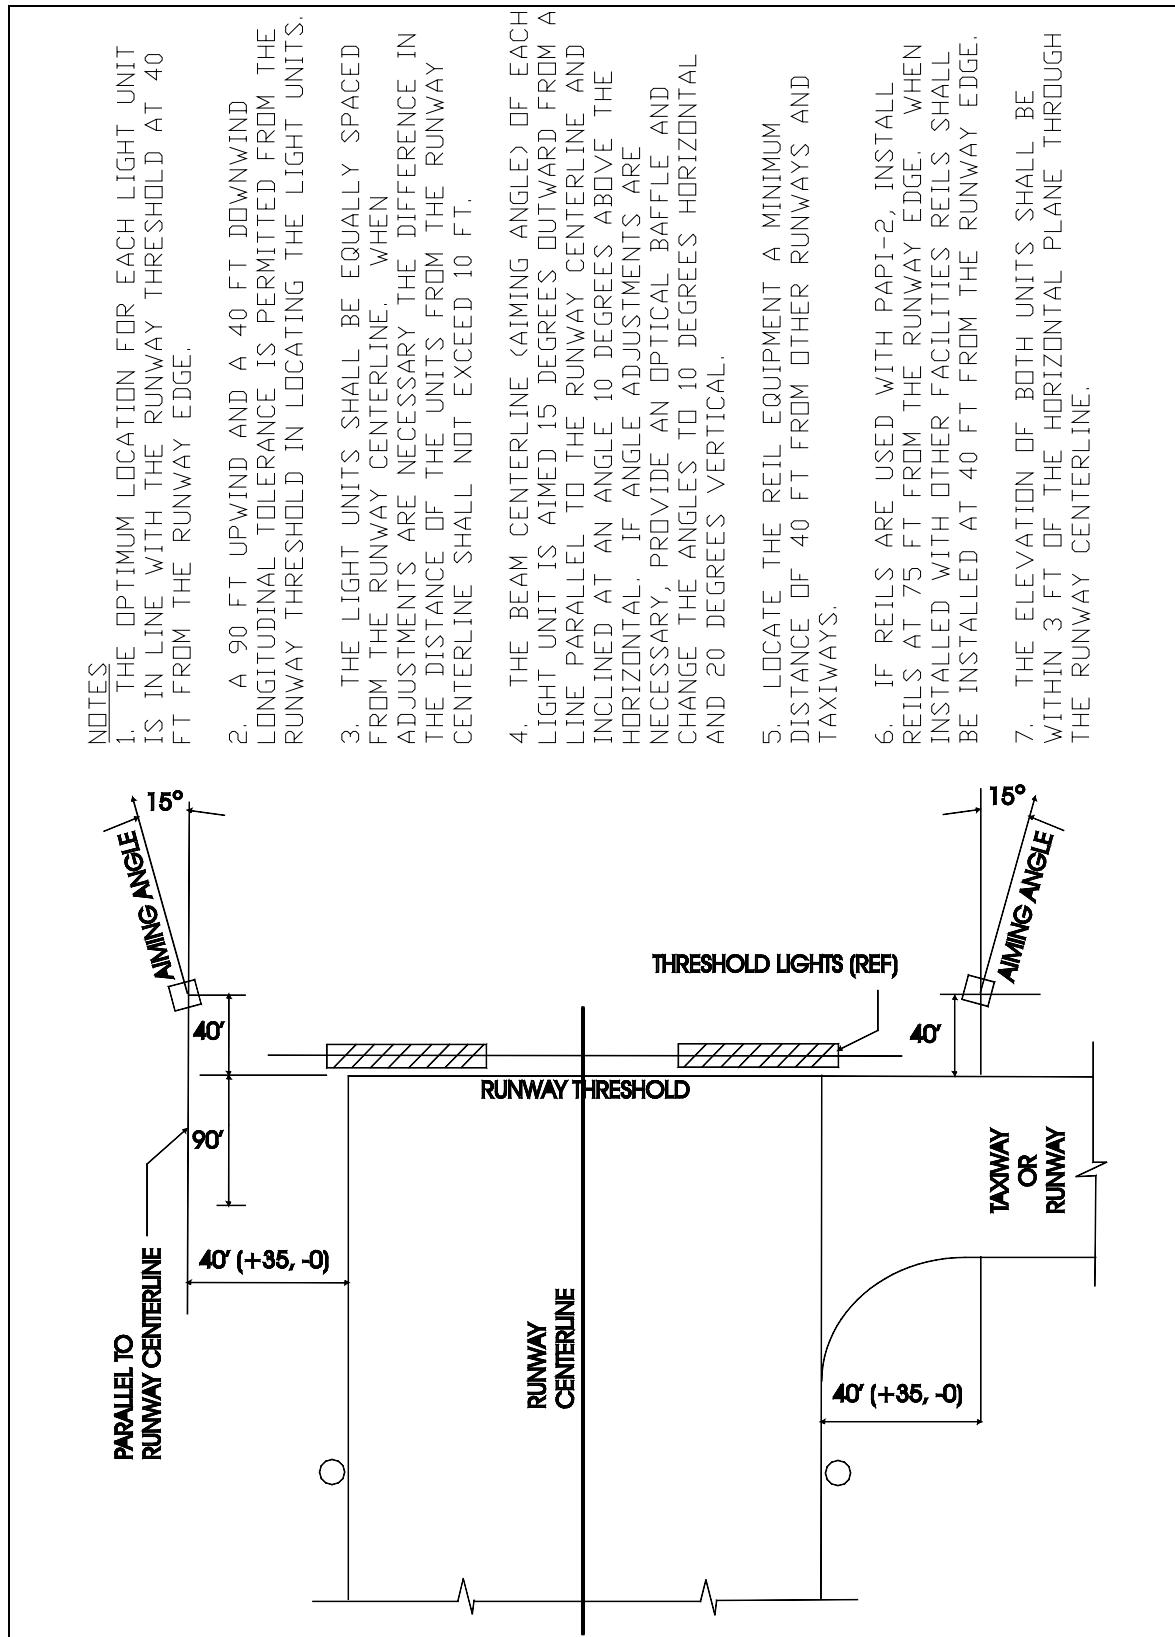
Typical Layout for Runway End Identifier Lights (REILs)
